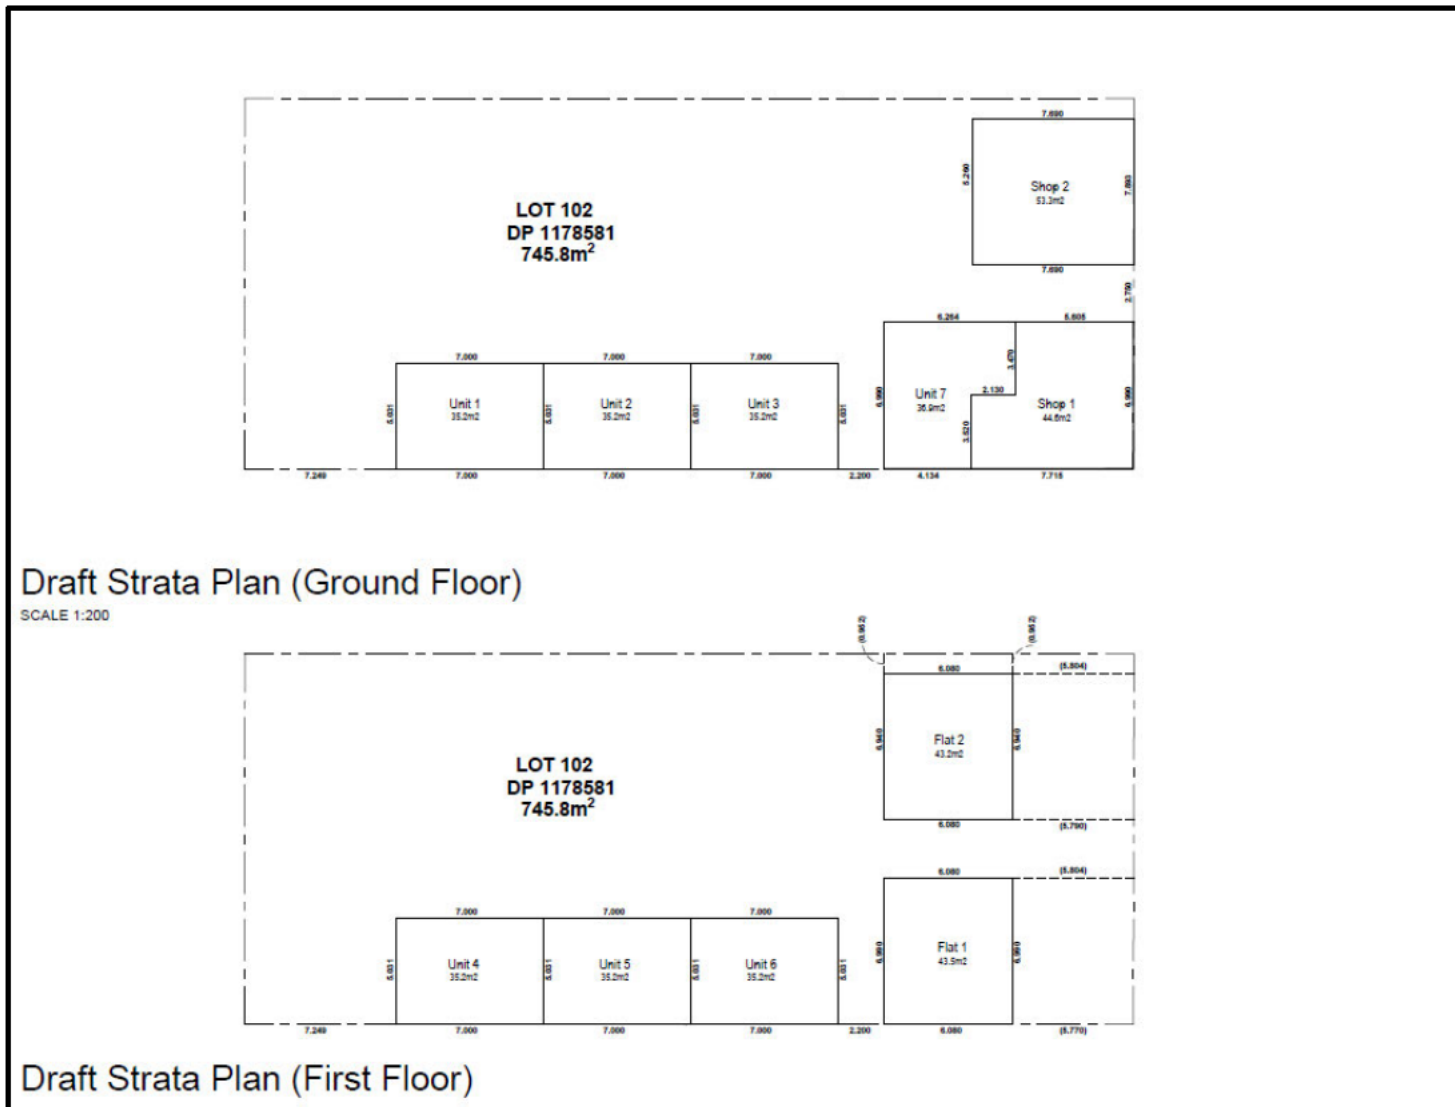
Proposed 11 lot strata subdivision plan (Source: CAD Design and Draft Pty Ltd, 2023)
